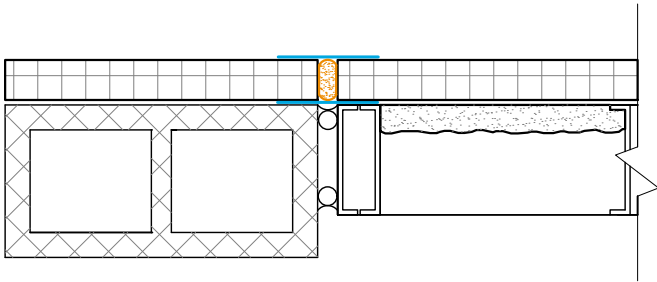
TRANSITION FROM STEEL STUD TO CMU BLOCK | PLAN
